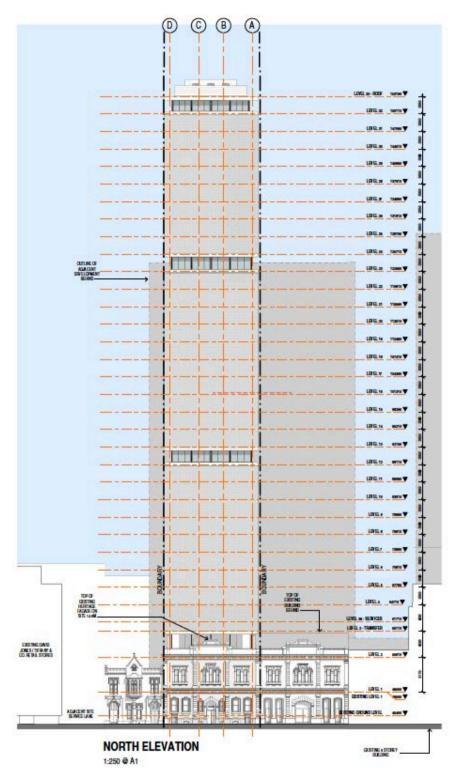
Image of northern elevation of proposed new tower (Brown Falconer)
